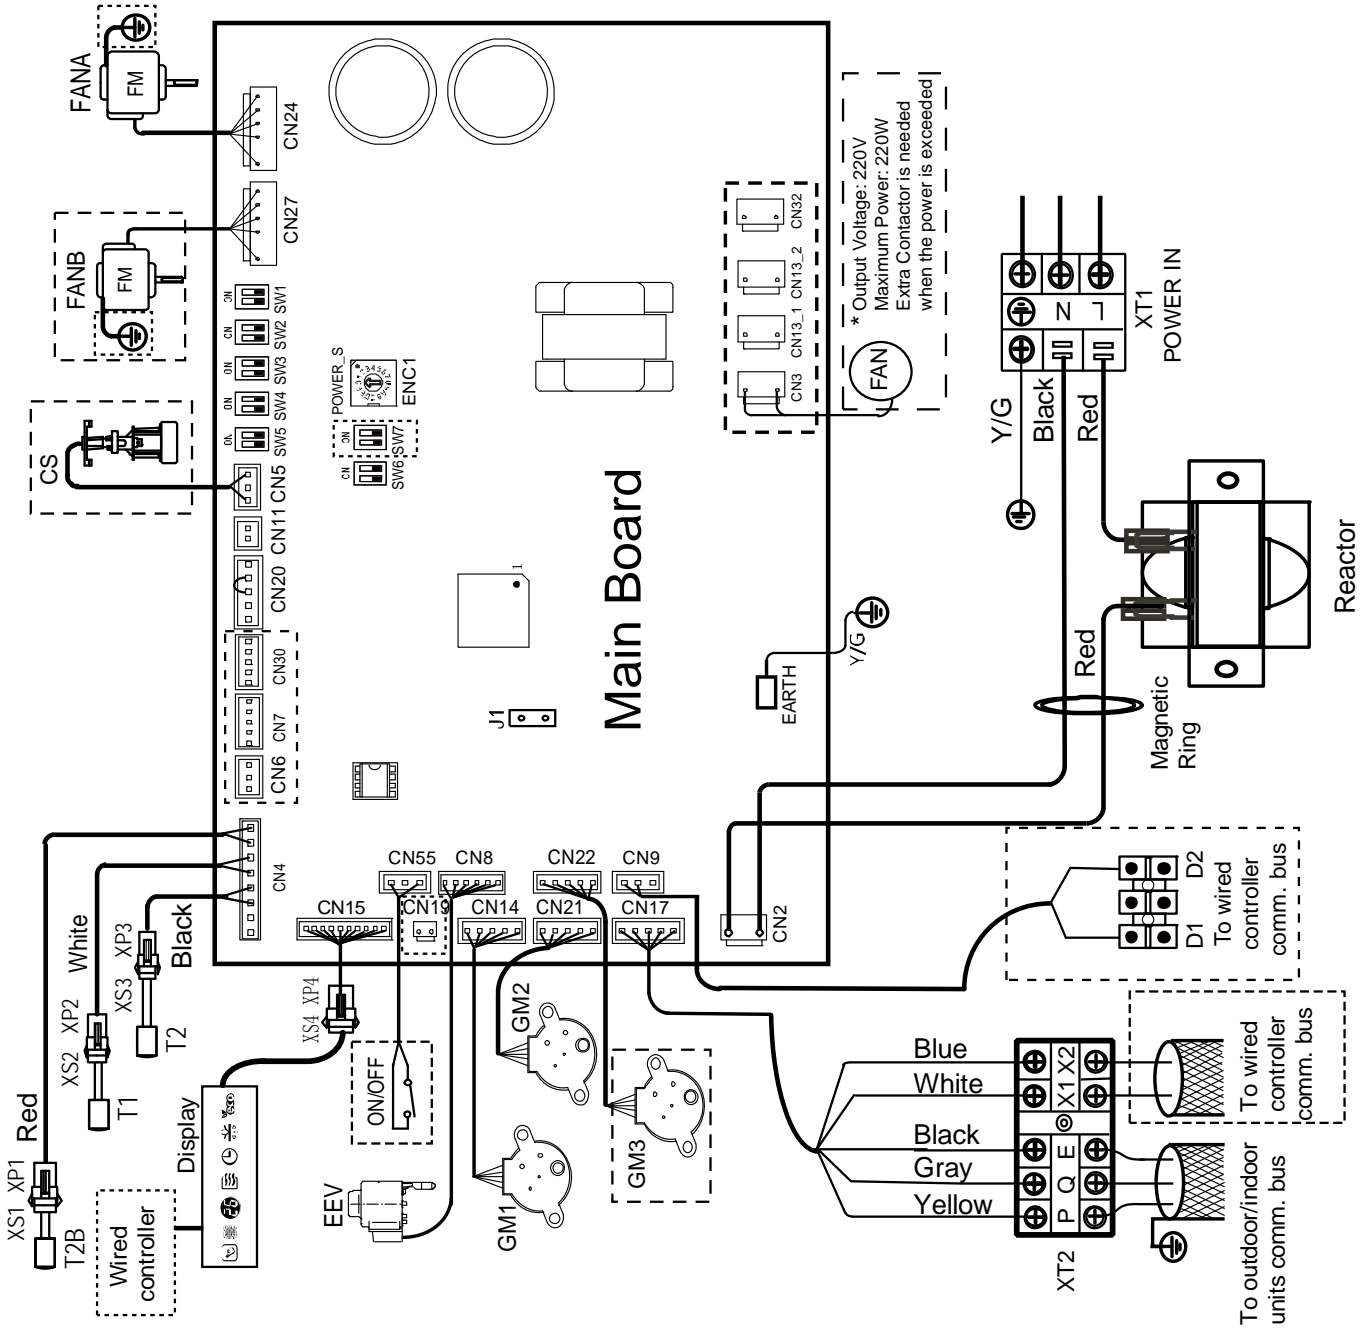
Ceiling & floor MI2-160DLHN1 wiring diagram
